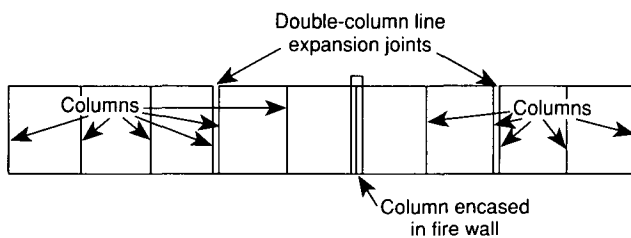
(c) Tied wall where framing is not continuous throughout the building.
